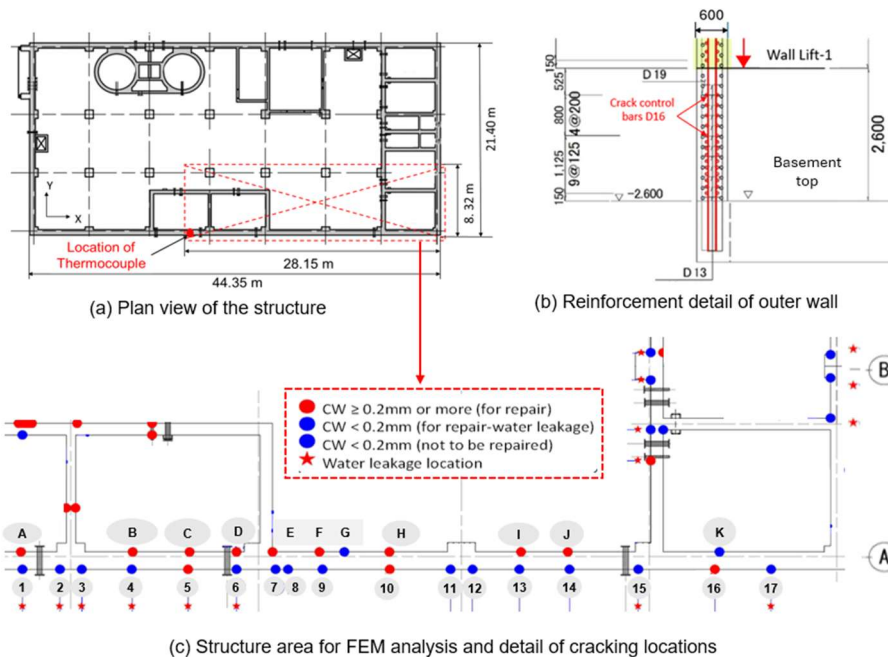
Reinforcement and cracking detail of the outer wall to be analyzed
